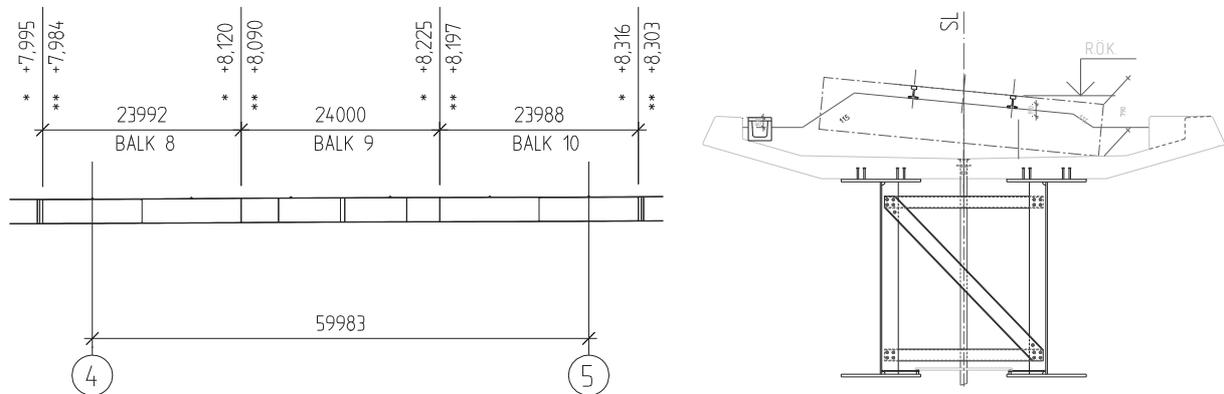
Elevation and cross section of the bridge over Veckefjärden. The cross bracings are made of channels bolted to the web stiffeners.
